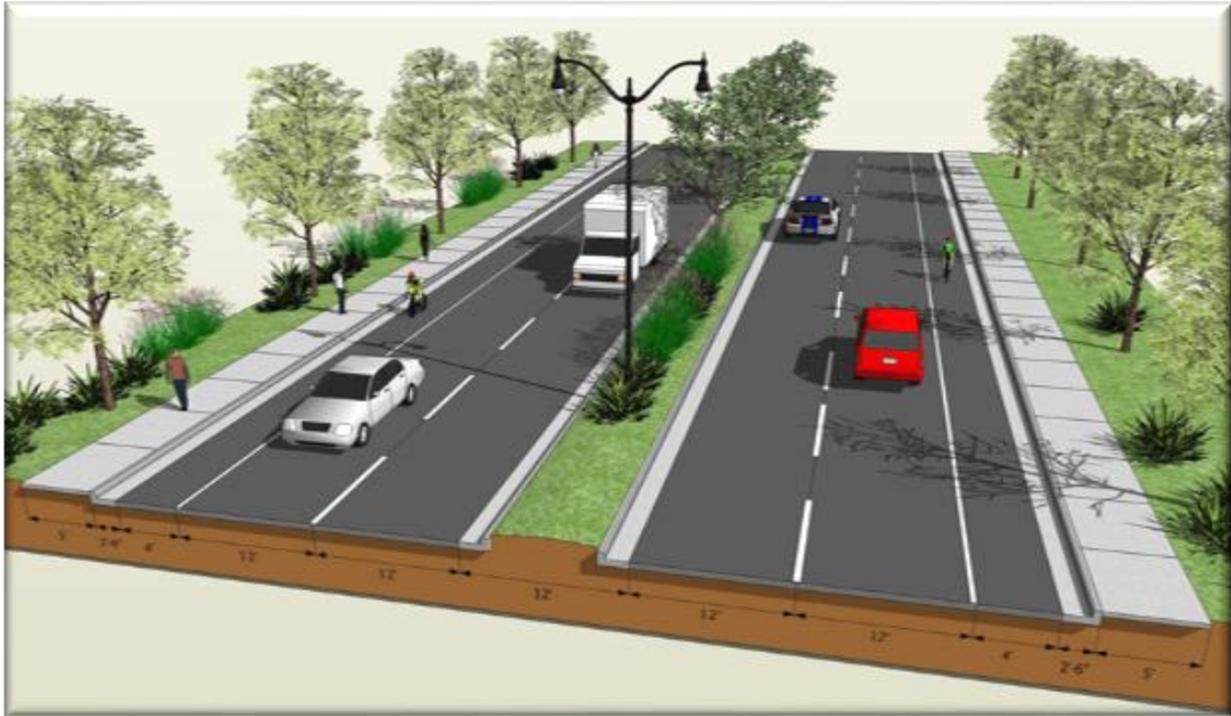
Rendering of Proposed Improvements to Dedeaux Road
